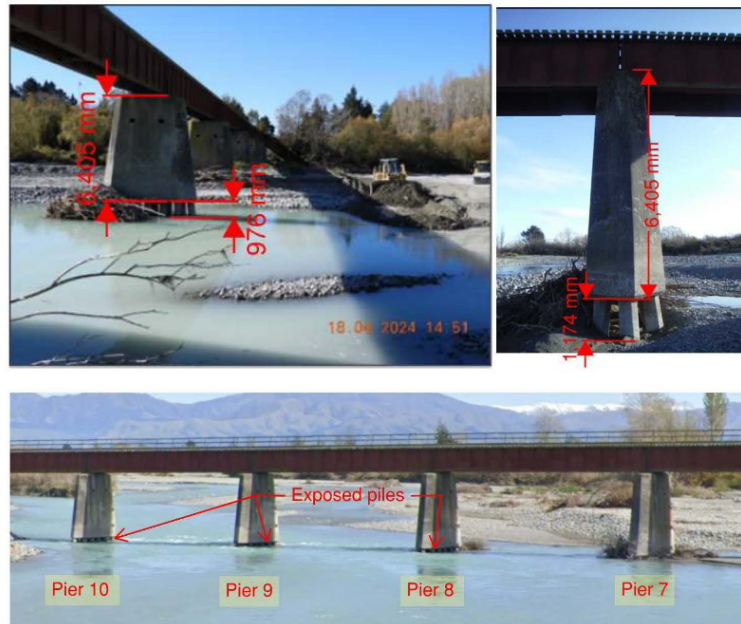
Photos at riverbed level showing scaled dimensions of Pier 6 (top left) with exposed piles and debris raft, 18 April 2024 (post-flood event), Pier 7 (right) with debris raft in 2020 (top right) and pile exposure evident on Piers 8, 9 and 10 pre-flood (bottom).
